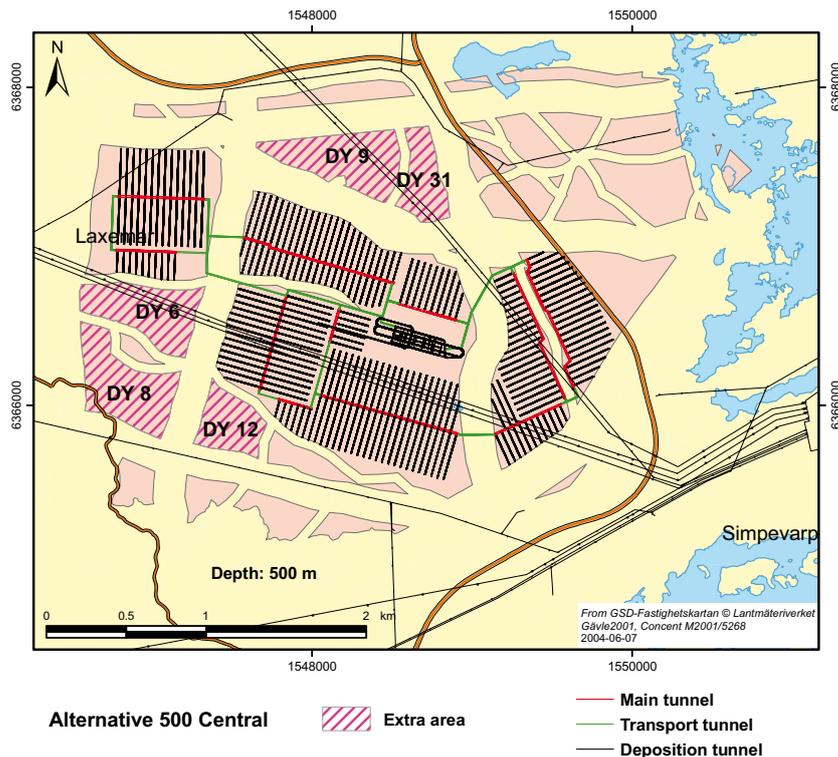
Potential Layout at Laxemar at the -500 m level. Due to the negligible risk of spalling in the deposition tunnels, tunnel orientations are selected to make best use of available space without consideration of stress orientation.
